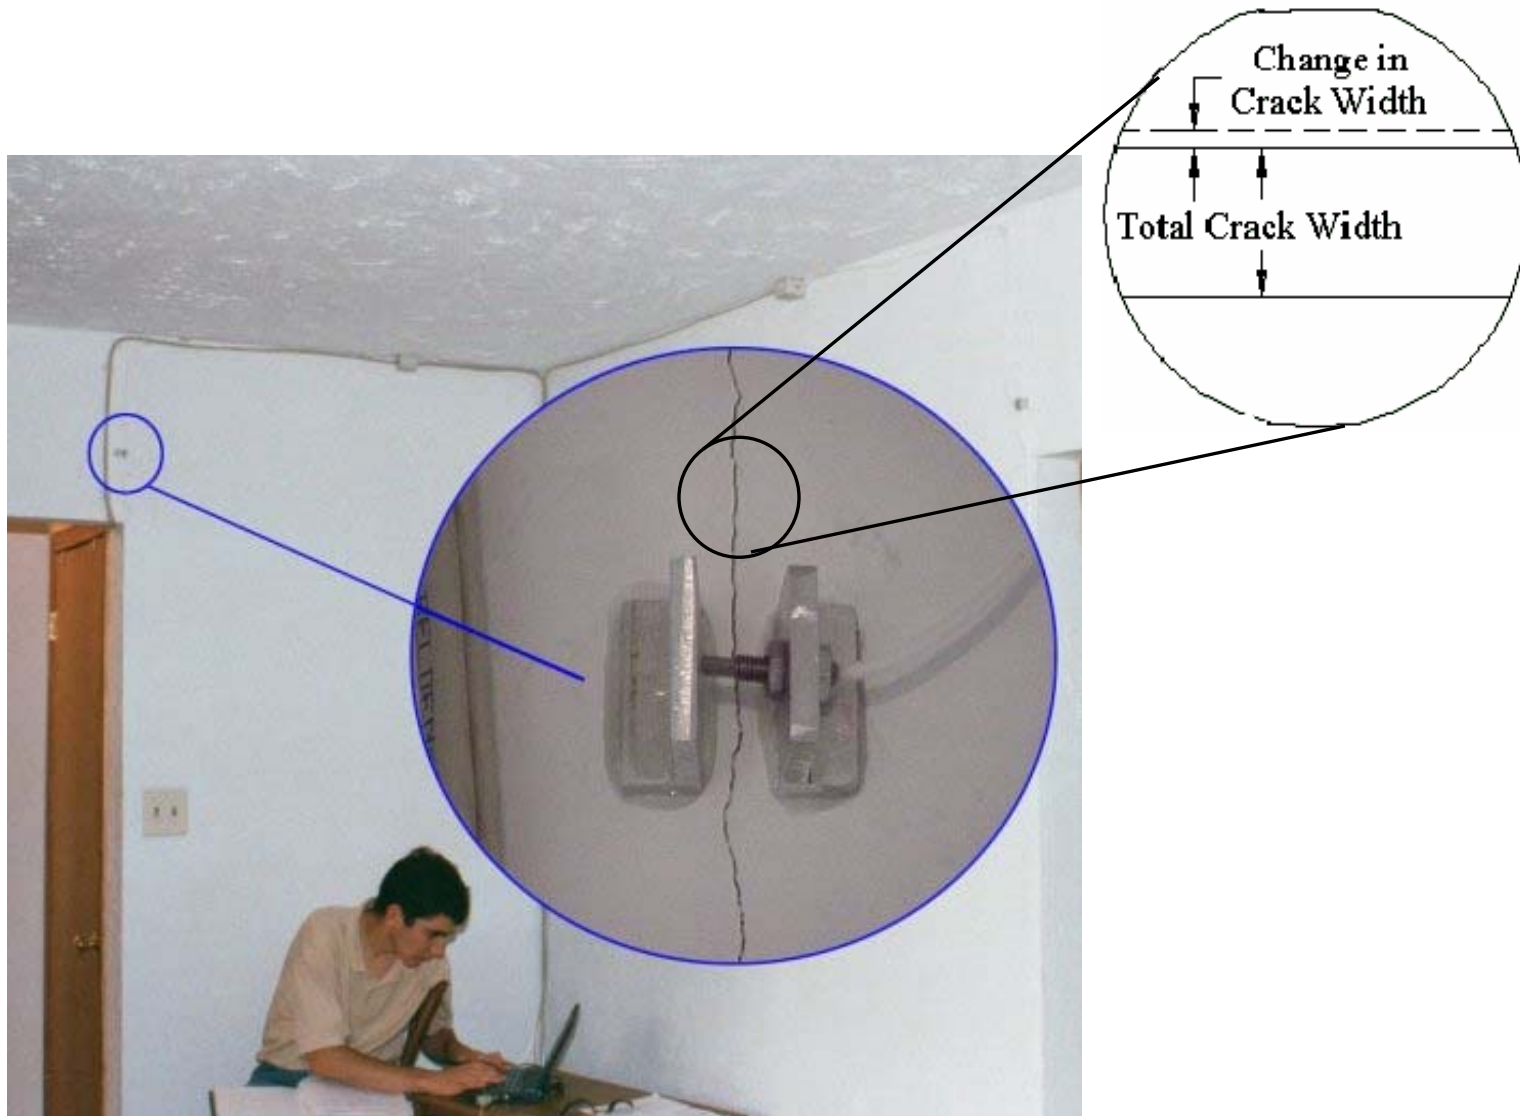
Typical threshold crack in a one-story concrete block house
